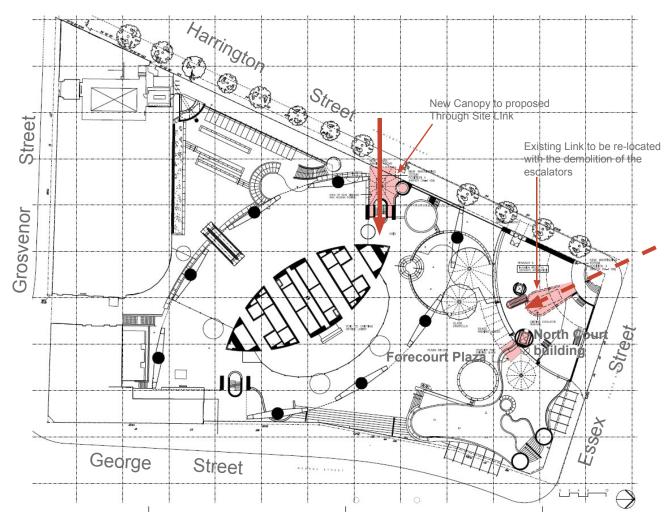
Floor plan at the Harrington Street level with the proposed alterations and additions shaded pink. Note the proposed canopy to provide weather protection to the existing lift and stairs, and the removal of the escalator from the North Court building
